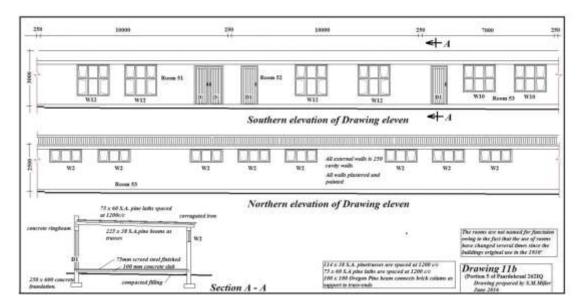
Above. Northern elevation of the building captured in Drawing 11. (Drawing S.M. Miller 2016.)
